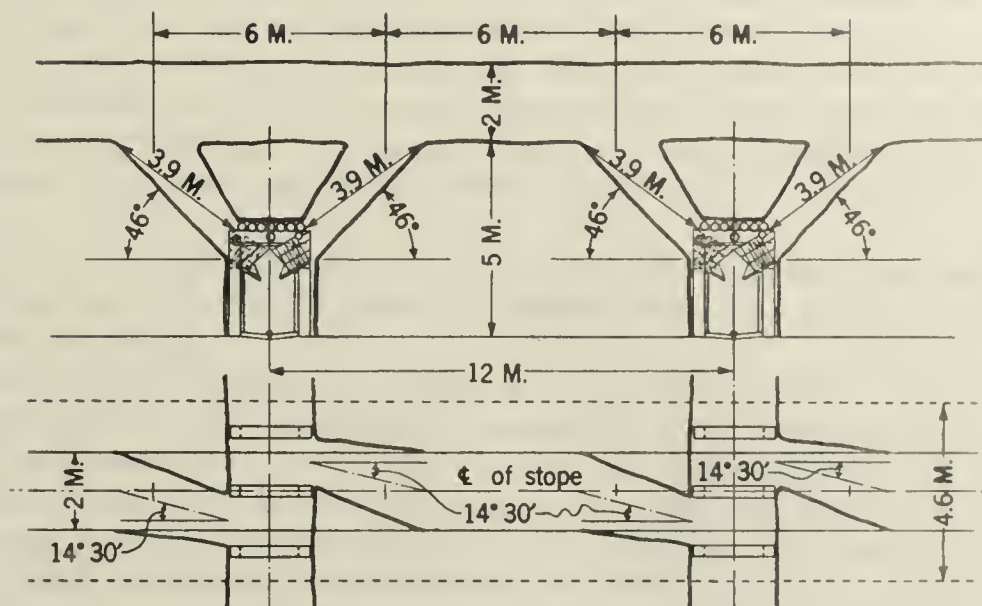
Stope chute raises. Stope raised on new system normal to drift
